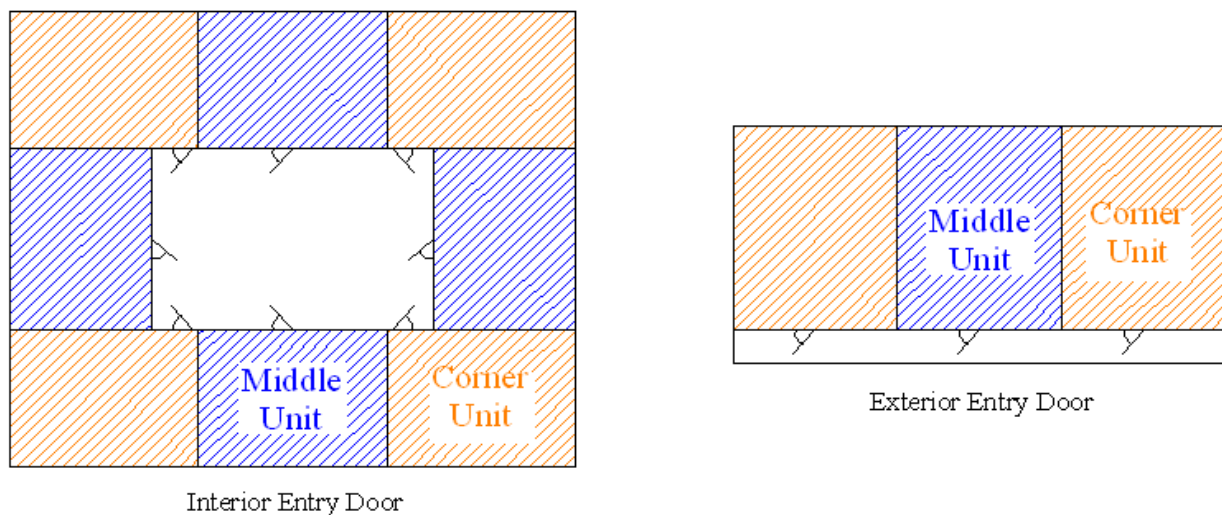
Apartment types according to layout (left: closed building with interior entry door; right: open building with exterior entry door).
